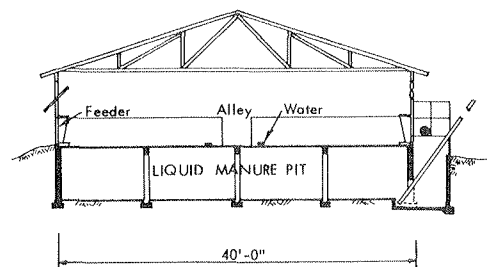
Midwest Plan Service plan No. 72675. This and other Midwest Plan Service plans are available through County Extension offices.
